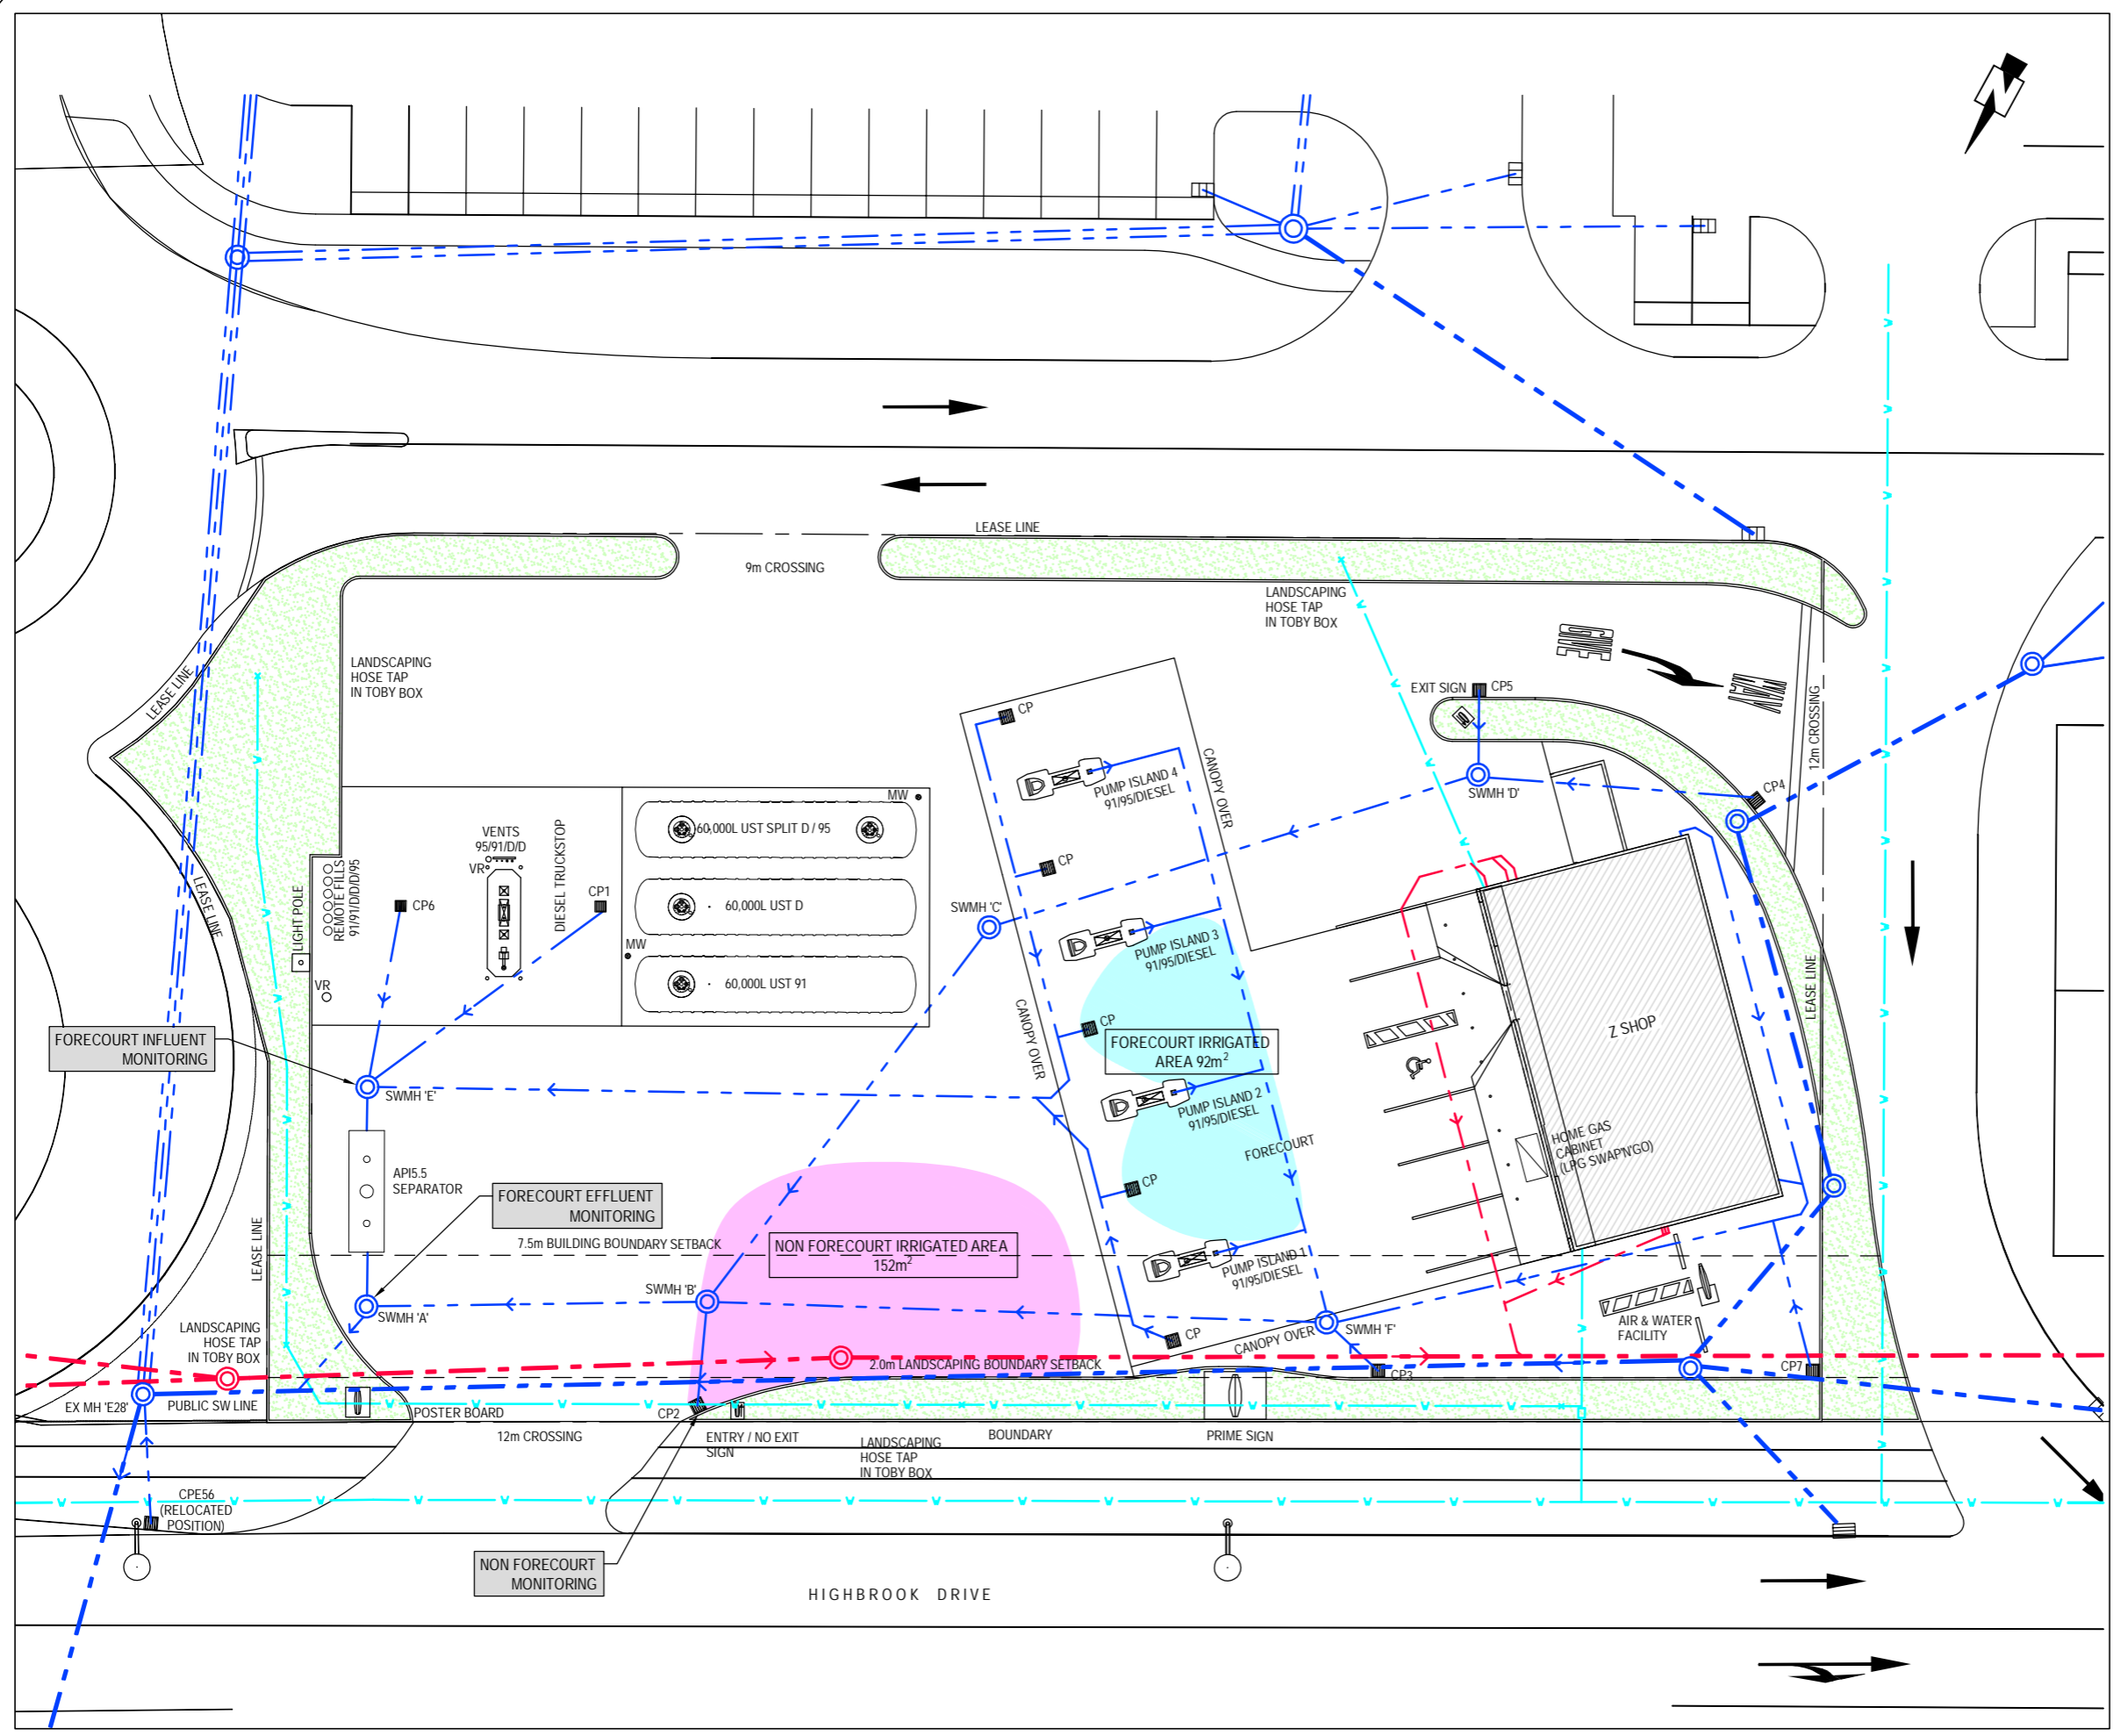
SITE PLAN - HIGHBROOK 13.03.13
